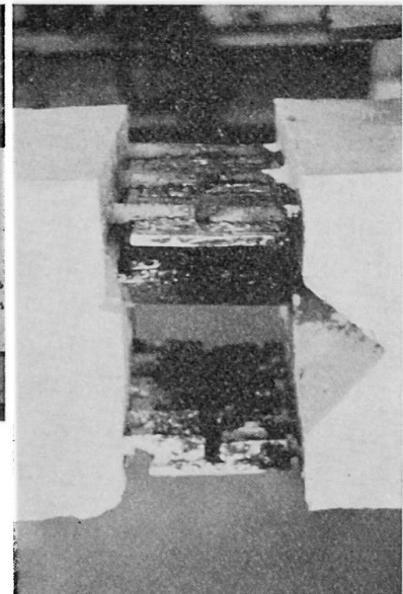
Jointing of reinforcing bars, using steel plates lying under the bars.
